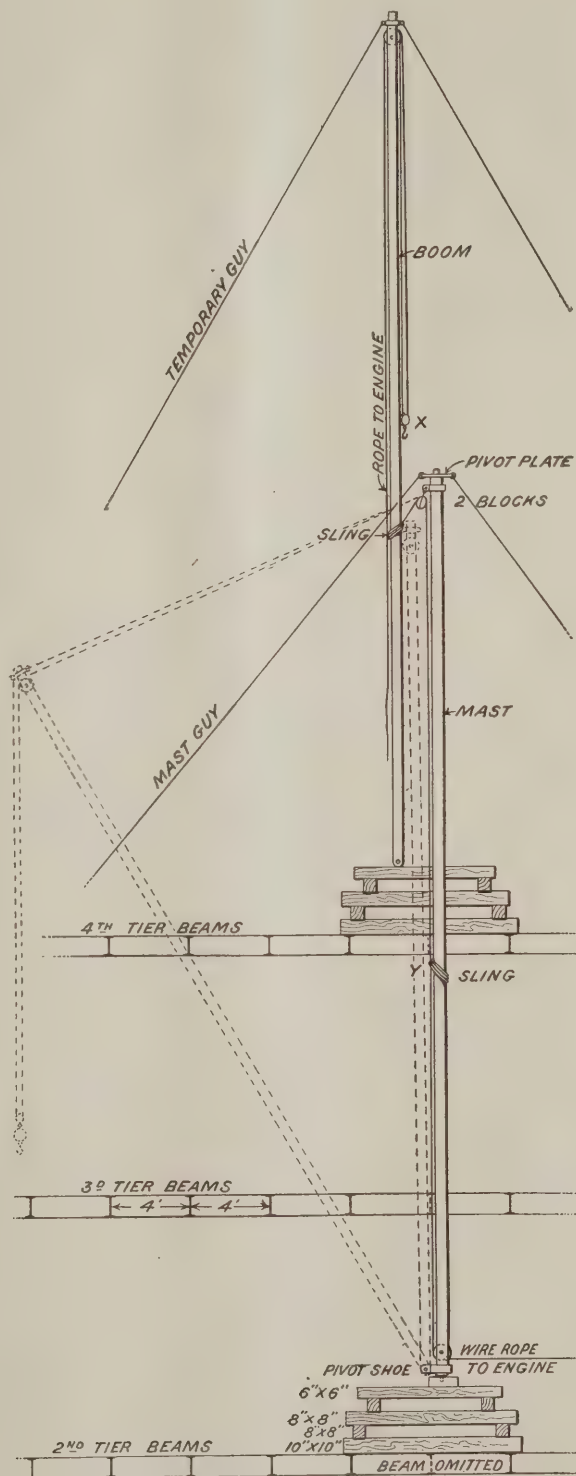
Showing Derrick Set on One Tier of Girders and the Boom Raised to a New Level Above.
